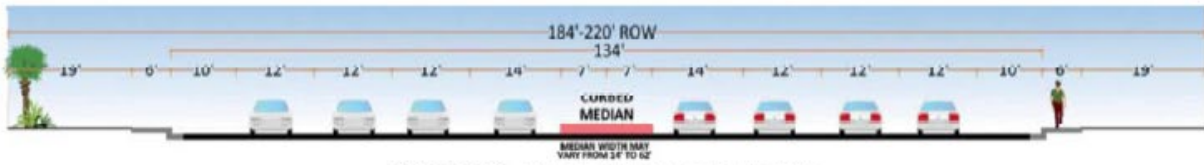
CITY OF JURUPA VALLEY GENERAL PLAN CIRCULATION ELEMENT
